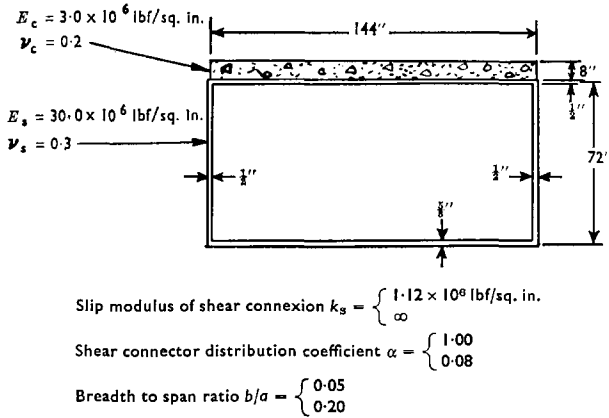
Details of some simply supported composite box girders used in partial interaction parametric study
